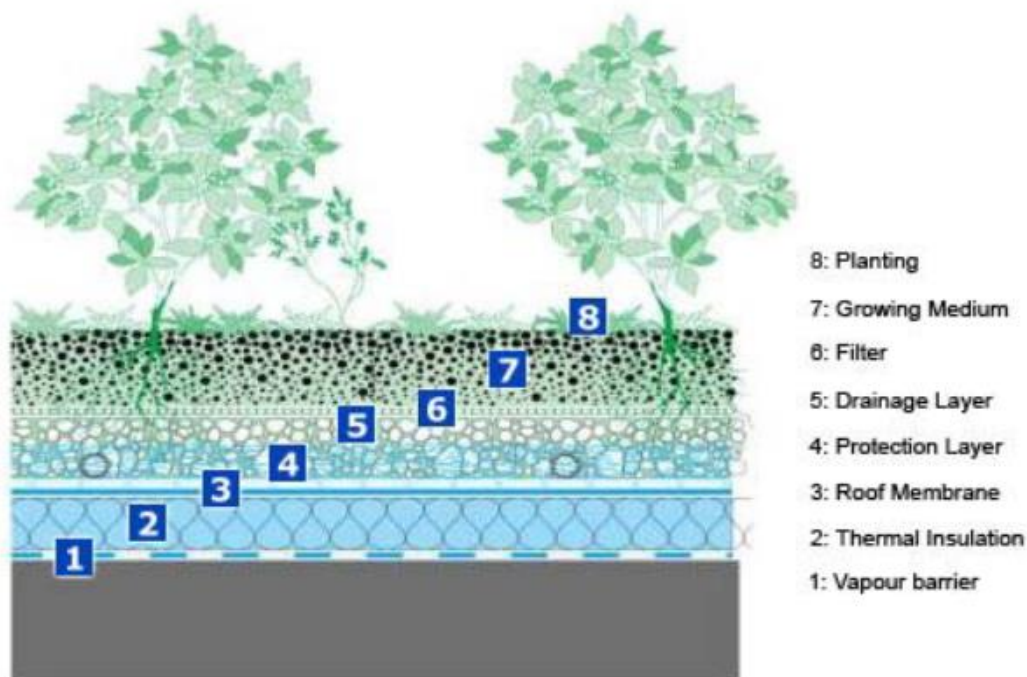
Green roof section (Scholtz-Barth,2001, p 87).
